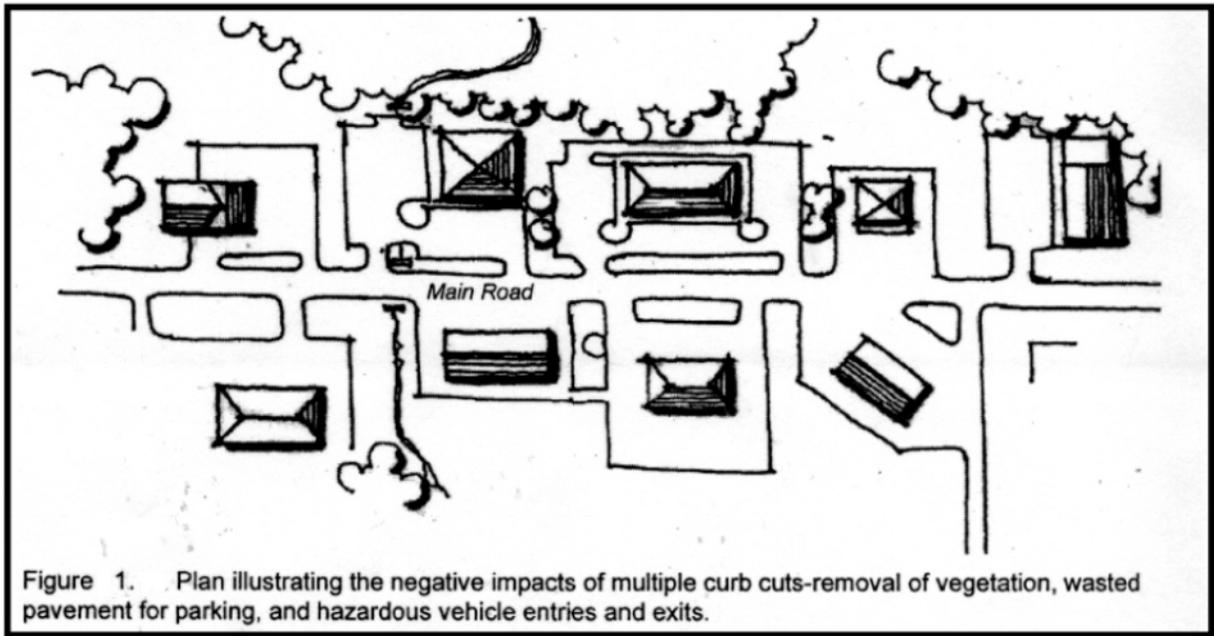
Plan illustrating the negative impacts of multiple curb cuts-removal of vegetation, wasted pavement for parking, and hazardous vehicle entries and exits.
